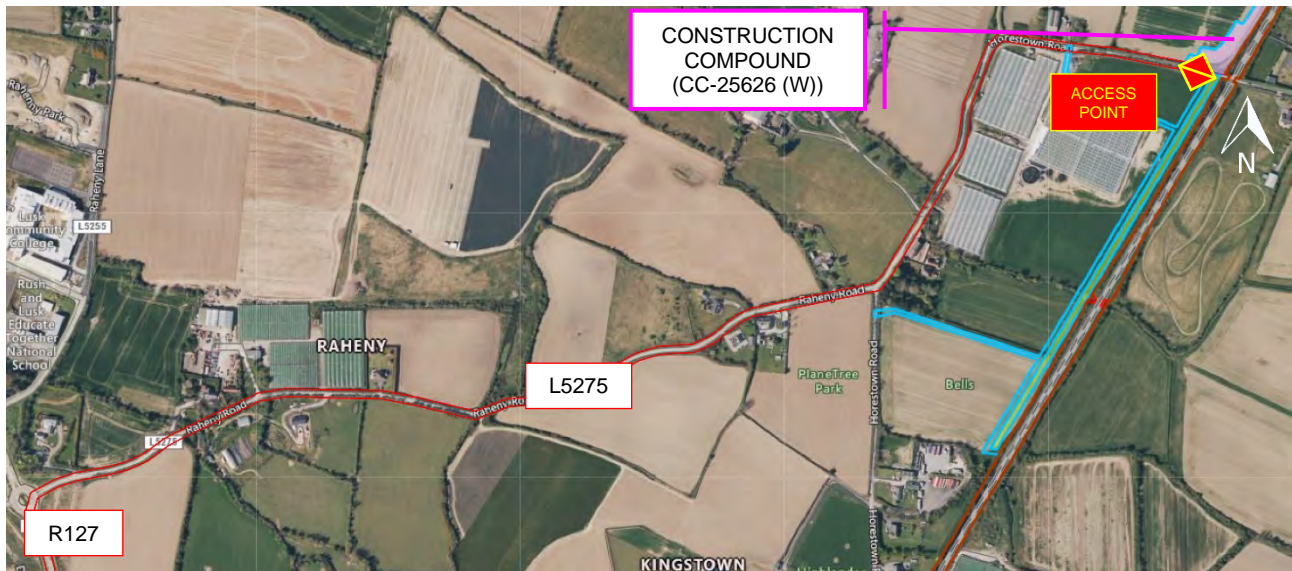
Tyrrelstown (OBB44) – Proposed Construction Access Route (Source: ESRI)
